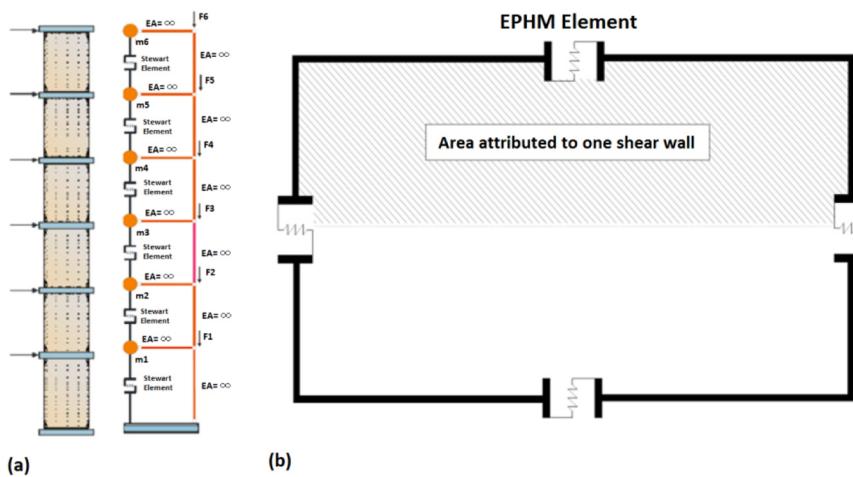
(a) Shear wall in Ruaumoko for 6 storey building (b) plan of shear building model in SapWood [81].
